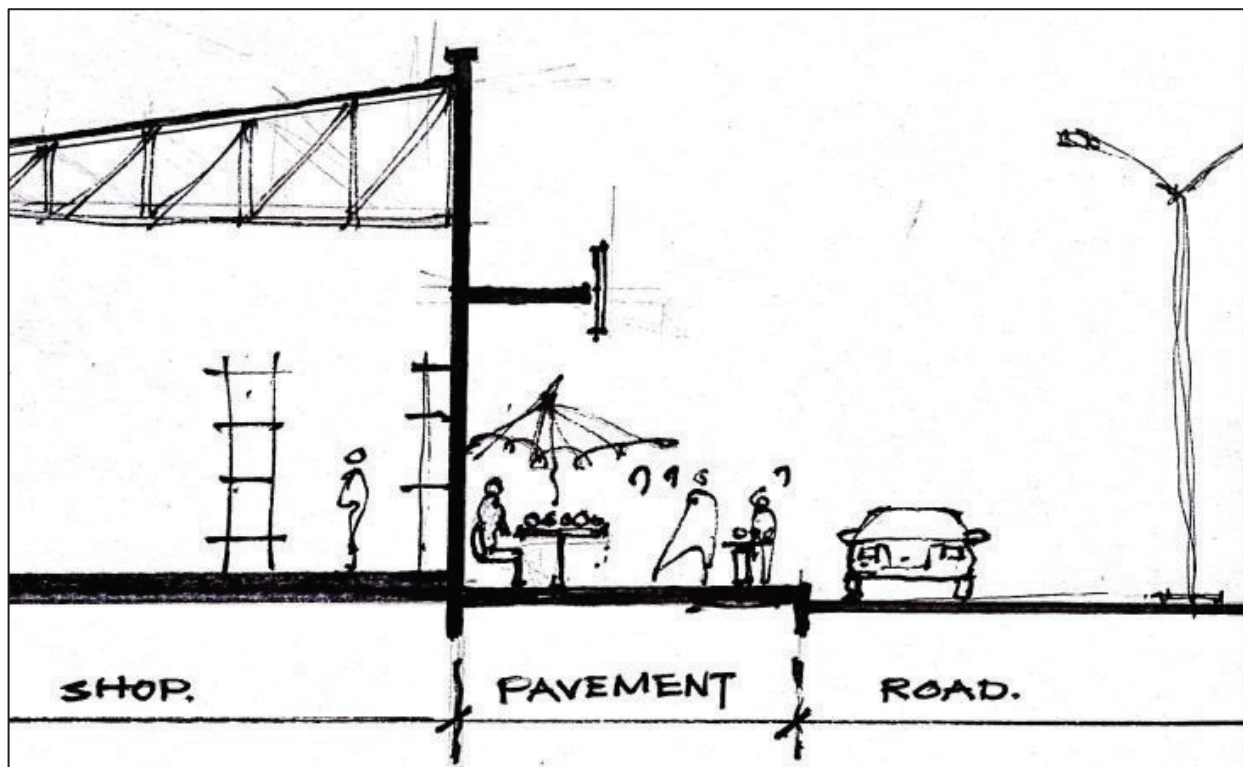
Typical section through a pavement encroached by street traders.
